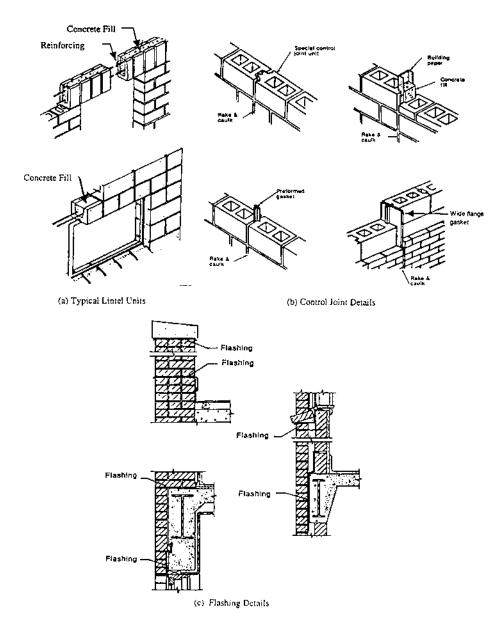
(a) Typical lintel units; (b) control joint details; (c) flashing details. (From Kolkoski 1988.)
